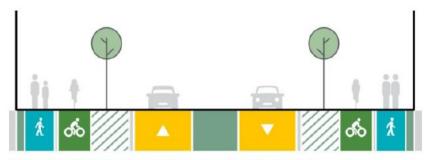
NOR W1 Trig Road (North) typical cross section - corridor
